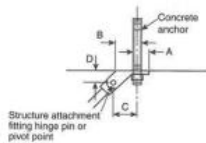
(a) Dimensions of Concrete Anchor for Orientations A, B, and C.
